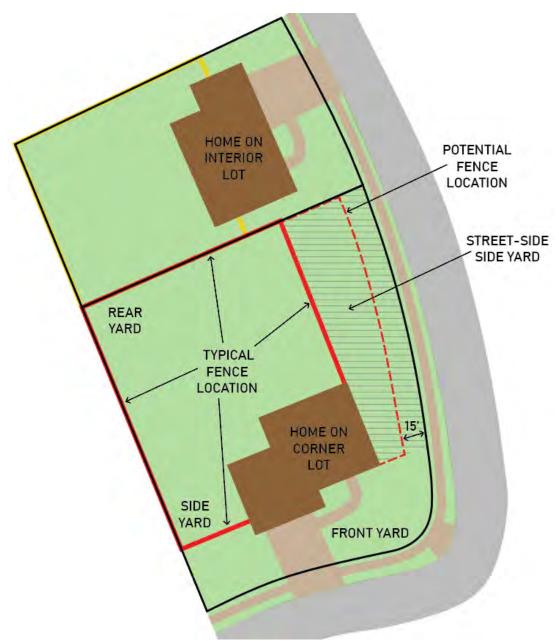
B-1: Corner lot fence location showing street-side side yard.
